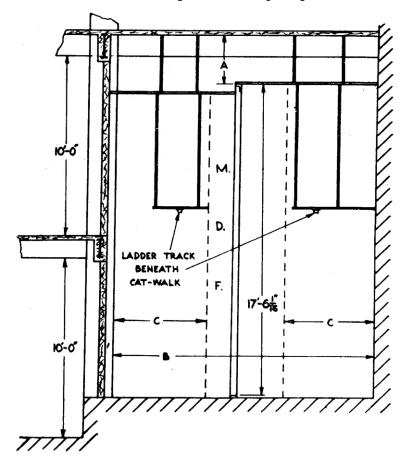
MEZZANINE TREATMENT OF GROUND FLOOR
